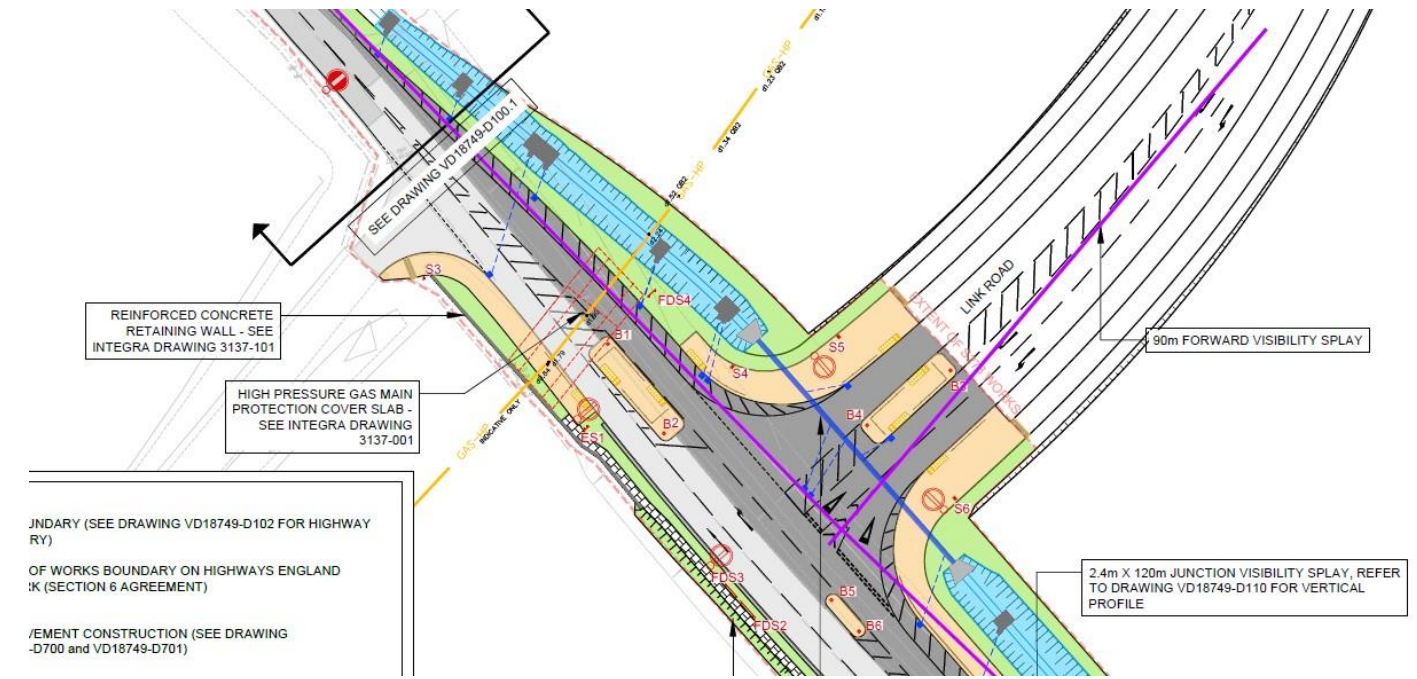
Current access arrangement for the new Rushden Lakes access road, with immitted crossing facilities.
